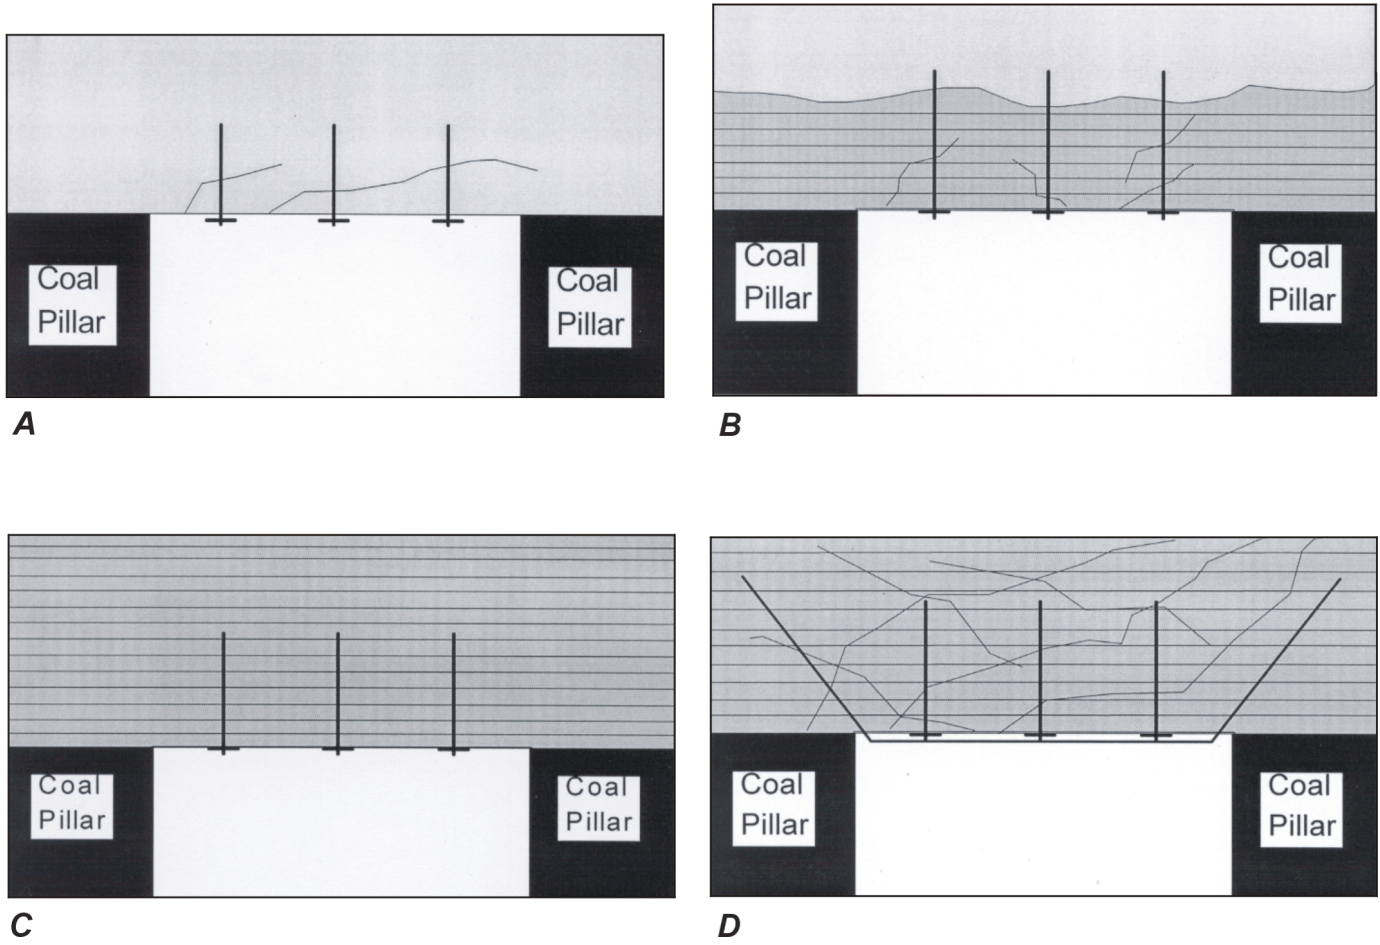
Roof support mechanisms. *A*, simple skin support; *B*, suspension; *C*, beam building; *D*, supplemental support in failing ground.
